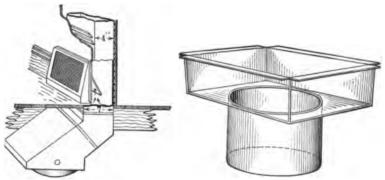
Method of connecting first floor register and riser to a single leader.
